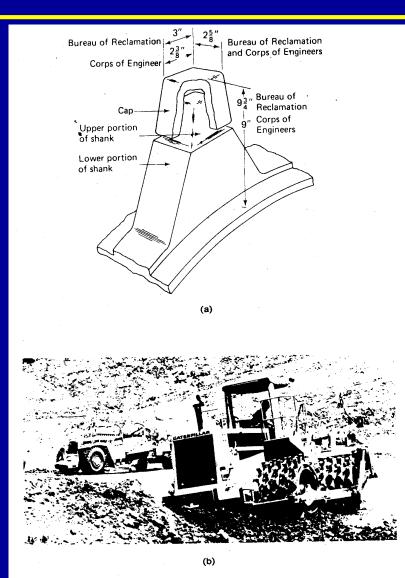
Sheepsfoot rollers: (a) detail of a rectangular sheepsfoot (drawing provided by Hyster Company, Construction Equipment Division); (b) self-propelled sheepsfoot roller in foreground ("pan" in background) (photograph courtesy of Caterpillar Tractor Co.).
